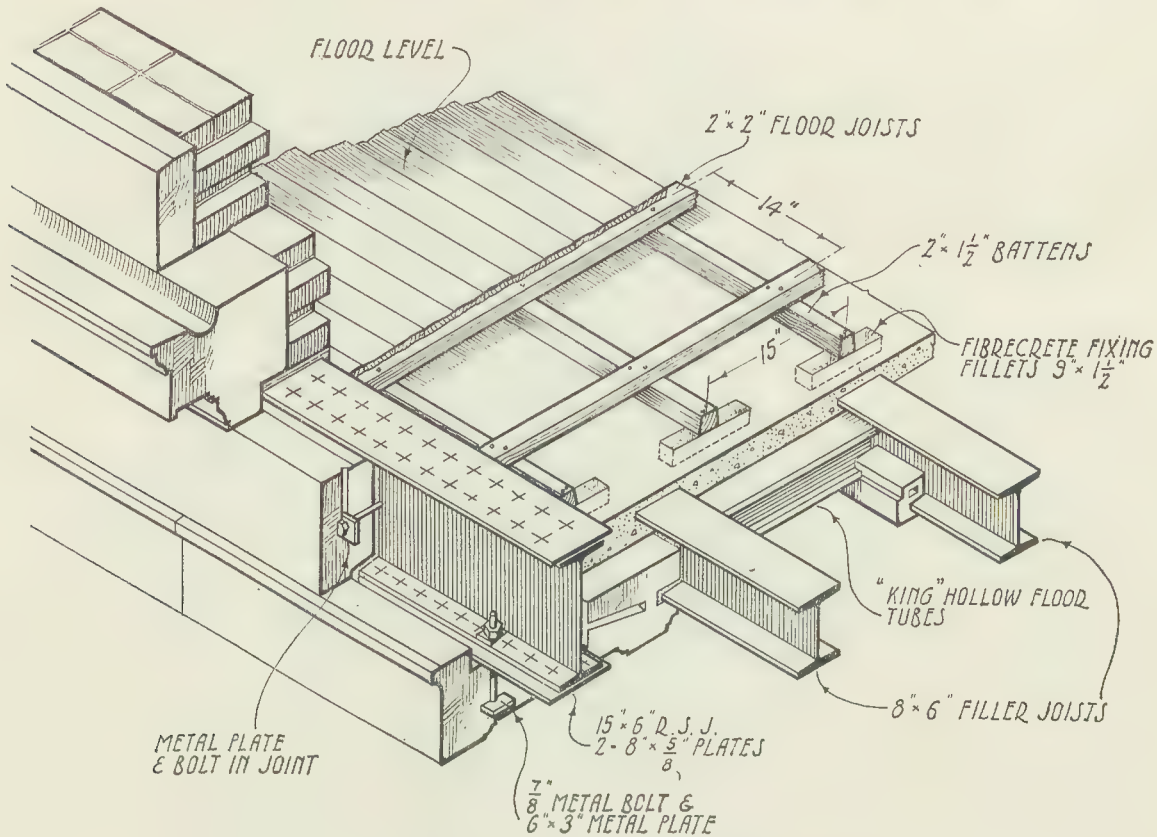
STONE SOFFIT COURSE ATTACHED TO STRUCTURAL STEELWORK
